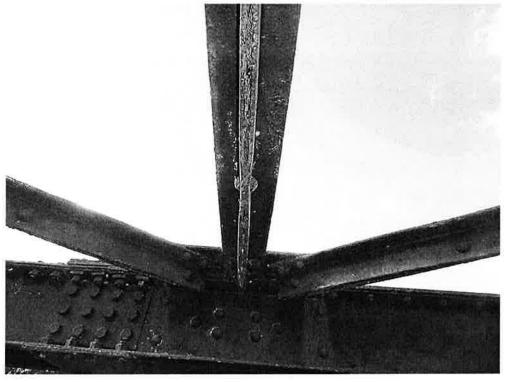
South tower at outer truss, looking south – lateral bracing angles have pack rust between adjacent legs.
